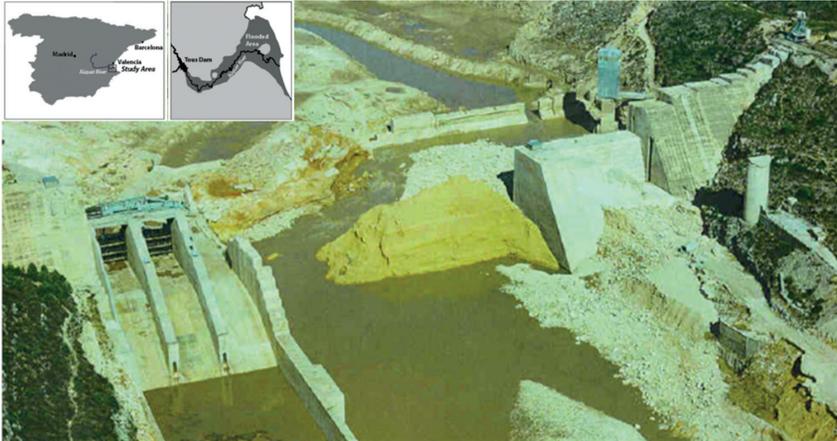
Tous Dam near Valencia, Spain after failure. Note the concrete abutments on both sides and washed-out clay core (yellow material) in the centre [5]
